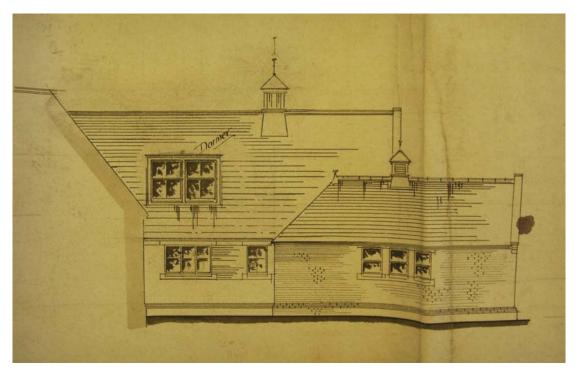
North-west elevation of the proposed additions at the south-west end of the building, 1891 (CRO(B) Z1041 1875-1904)
